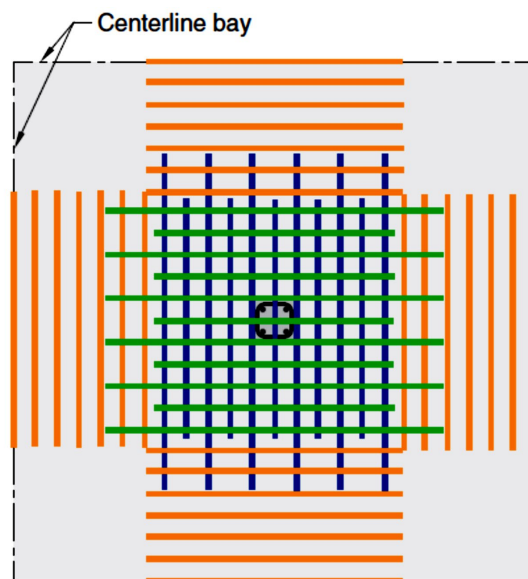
Arrangement of minimum reinforcement near the top of a two-way slab.
